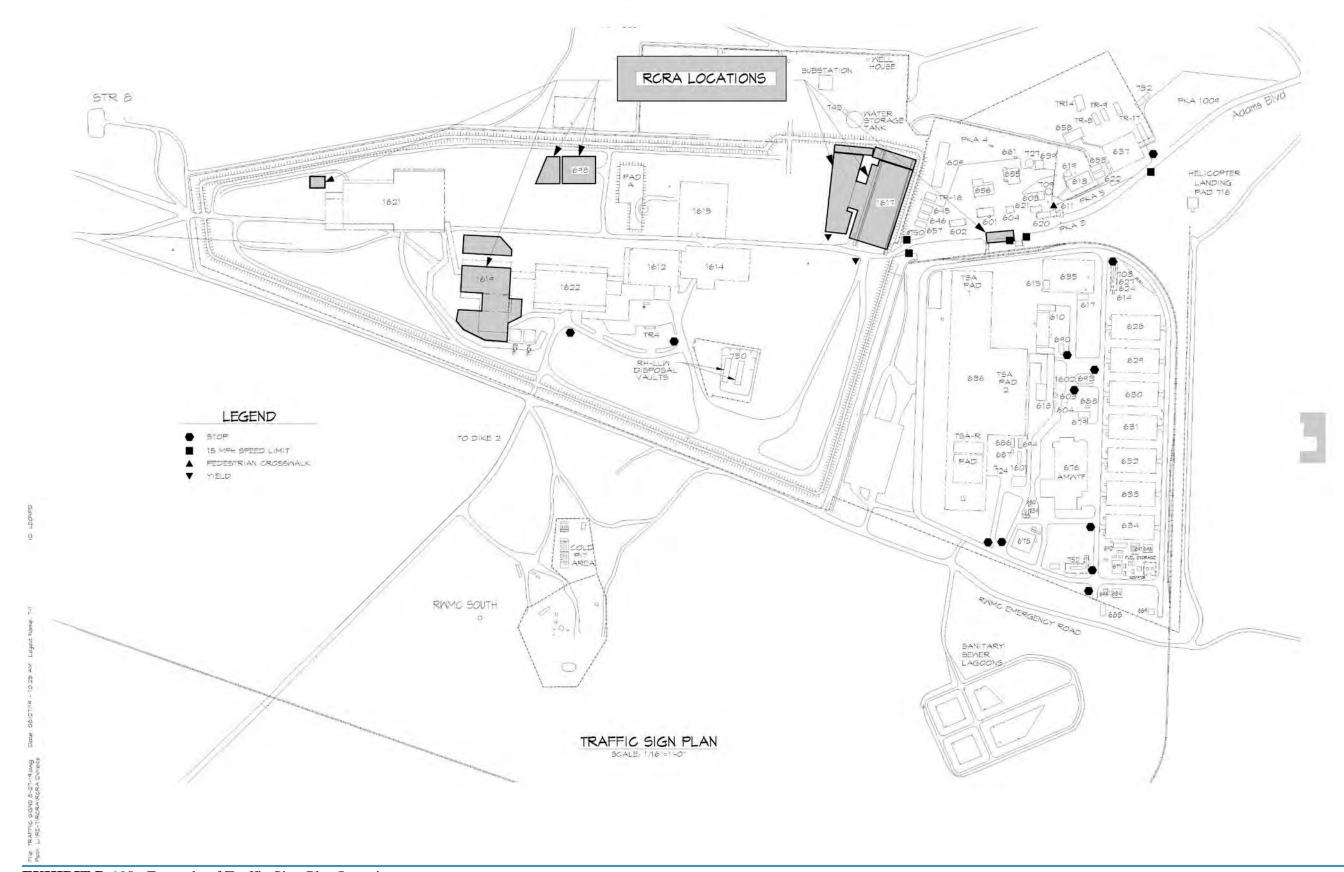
Example of Traffic Sign Plan/Location
